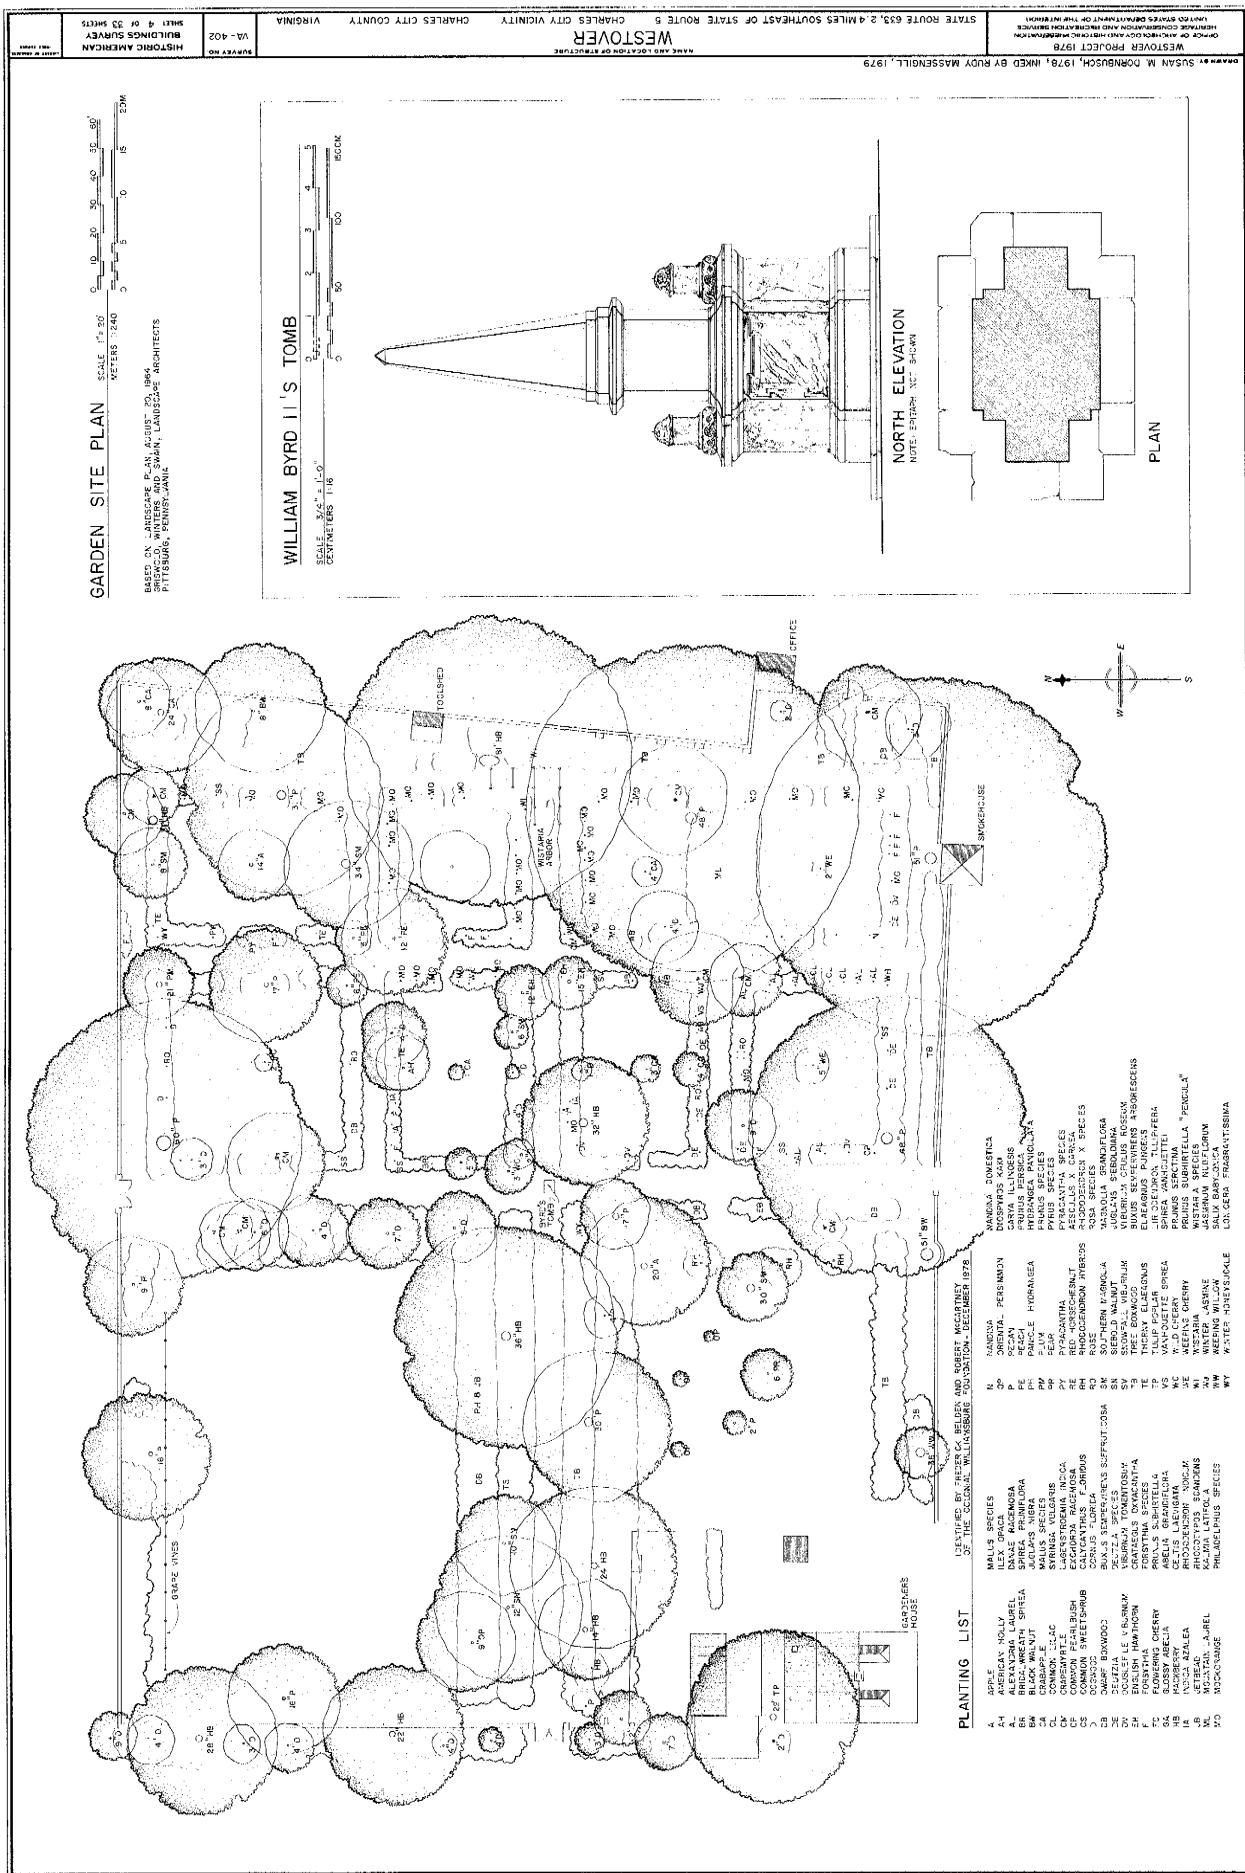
A complex, surveyed site plan showing tree and shrub locations, botanical designations, structures with highlighted roof shadows, fencing, river bulkheads, paths, roads, cemetery provides an excellent and complete landscape document of existing conditions at a 1"=40'. (HABS VA-402)
